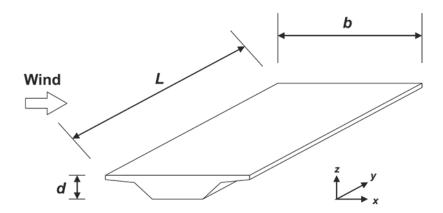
From Figure 8.1 - Cross-sections of normal construction decks.
